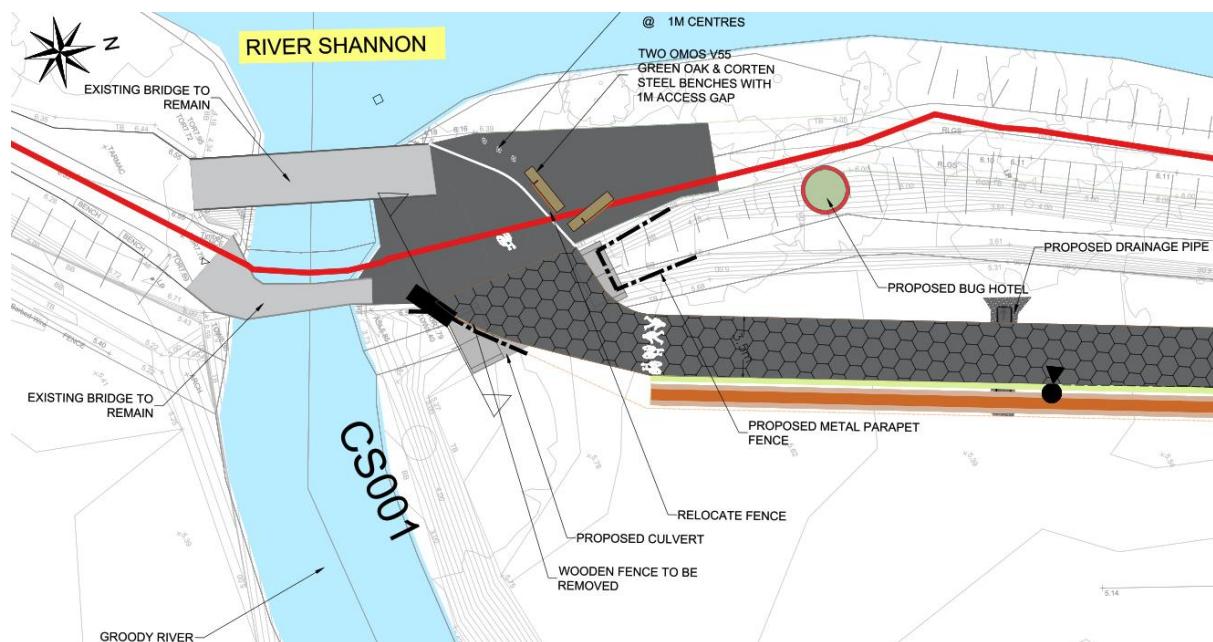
proposed amenity/rest area east of Groody Bridge
